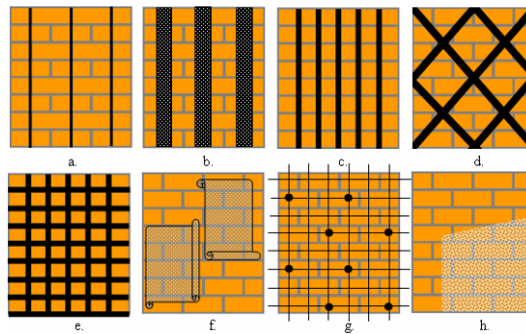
Strengthening procedures using FRP for URM: a. Composite bars embedded near surface in joints; b. Composite sheets bonded to wall surface; c. FRP plates; d. cross arrangements of FRP plates; e. grid disposition of FRP; f. carbon or glass fabric moisten in epoxy resin; g. FRP mesh; h. spray up technique.
